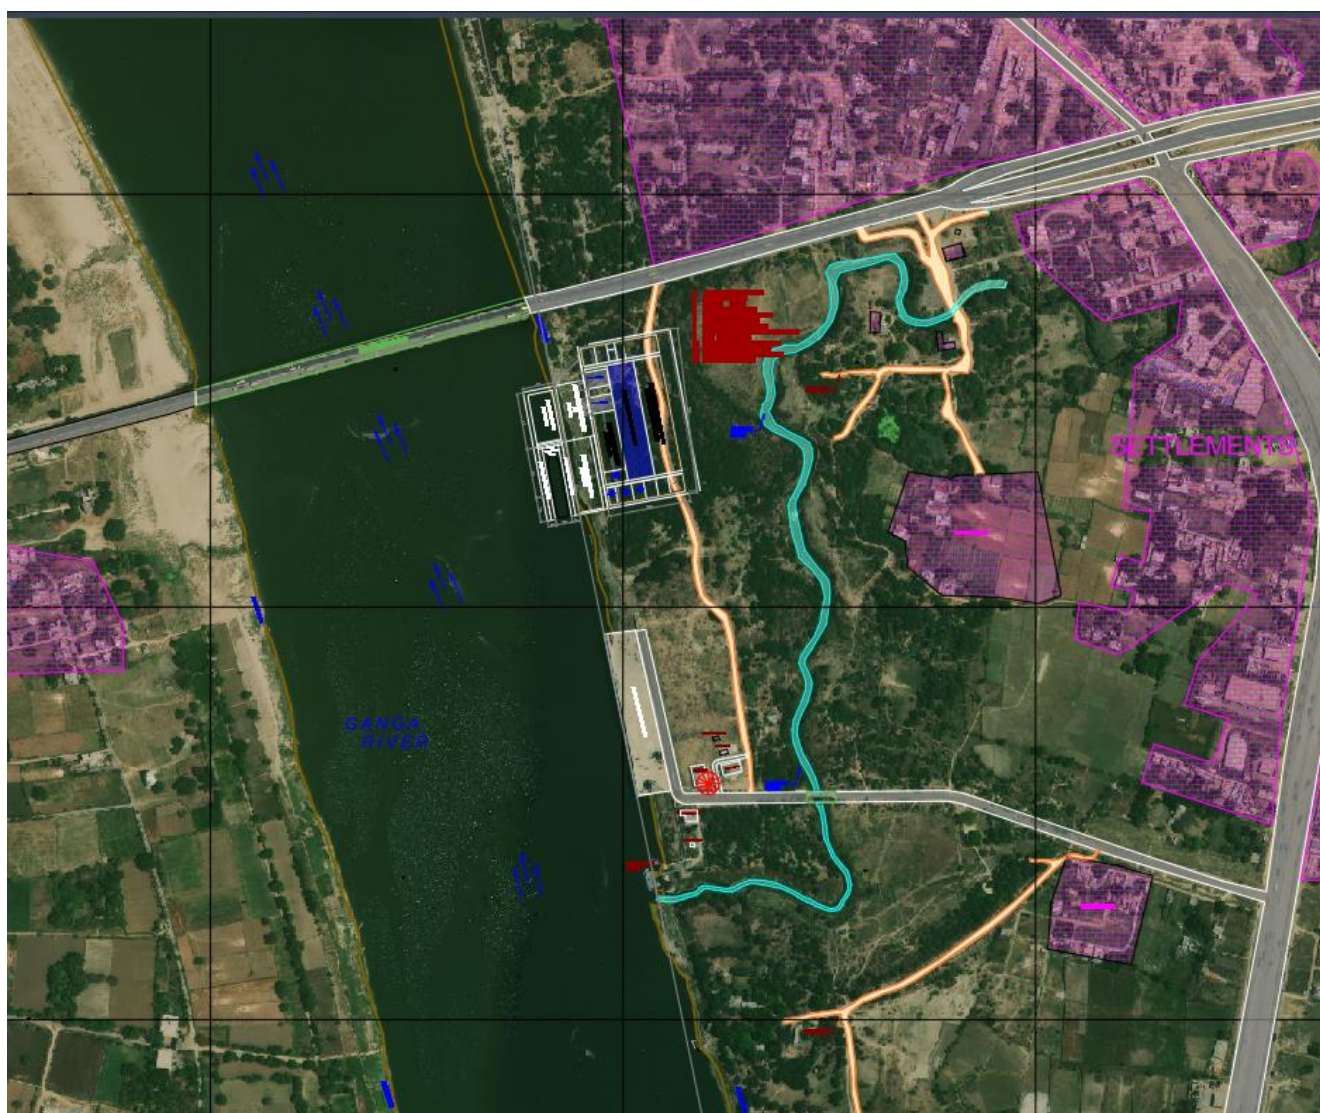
8 Typical layout of Ship Repair Facility in Varanasi
